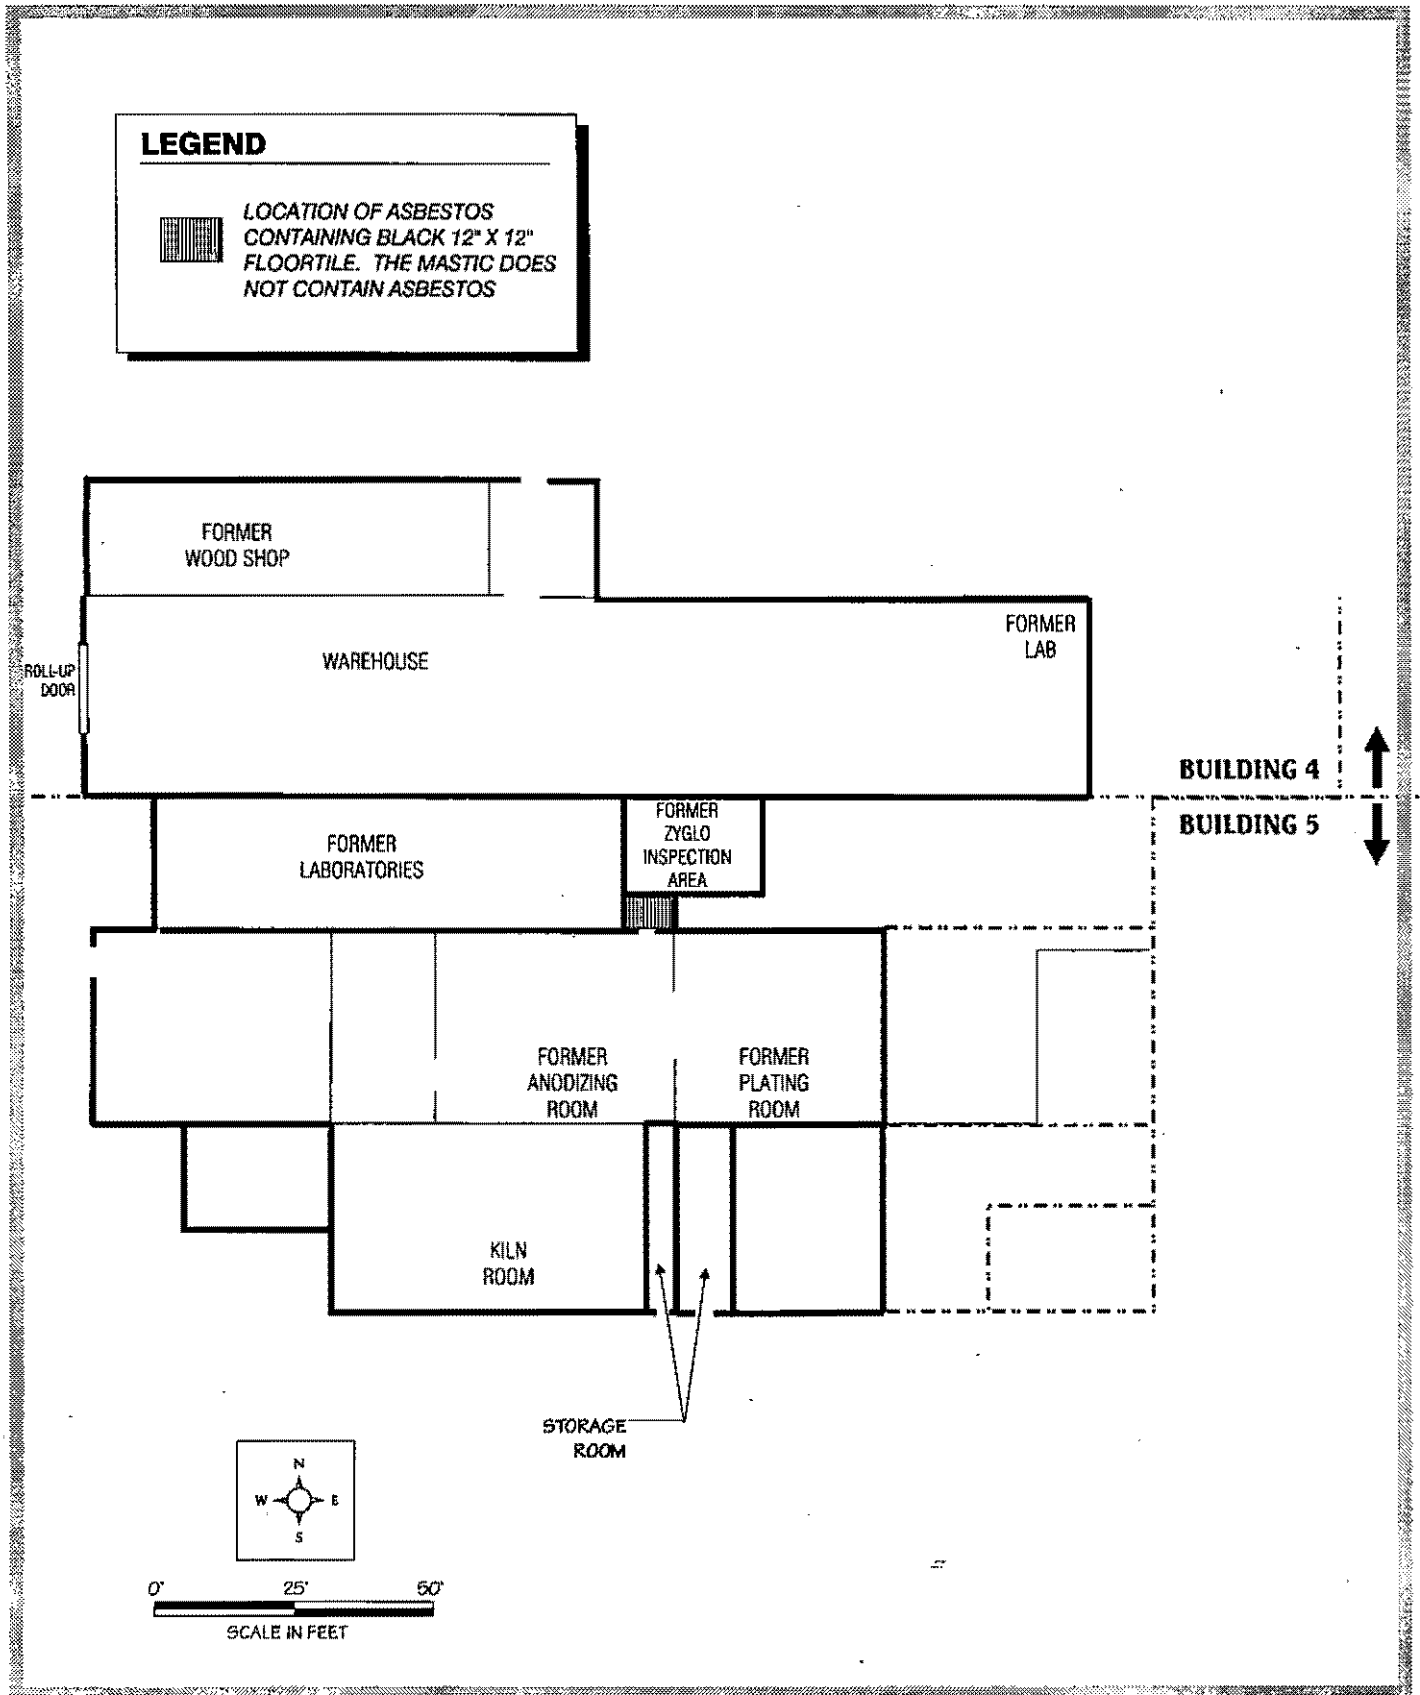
BUILDINGS 4 & 5 - ASBESTOS SAMPLING LOCATIONS
